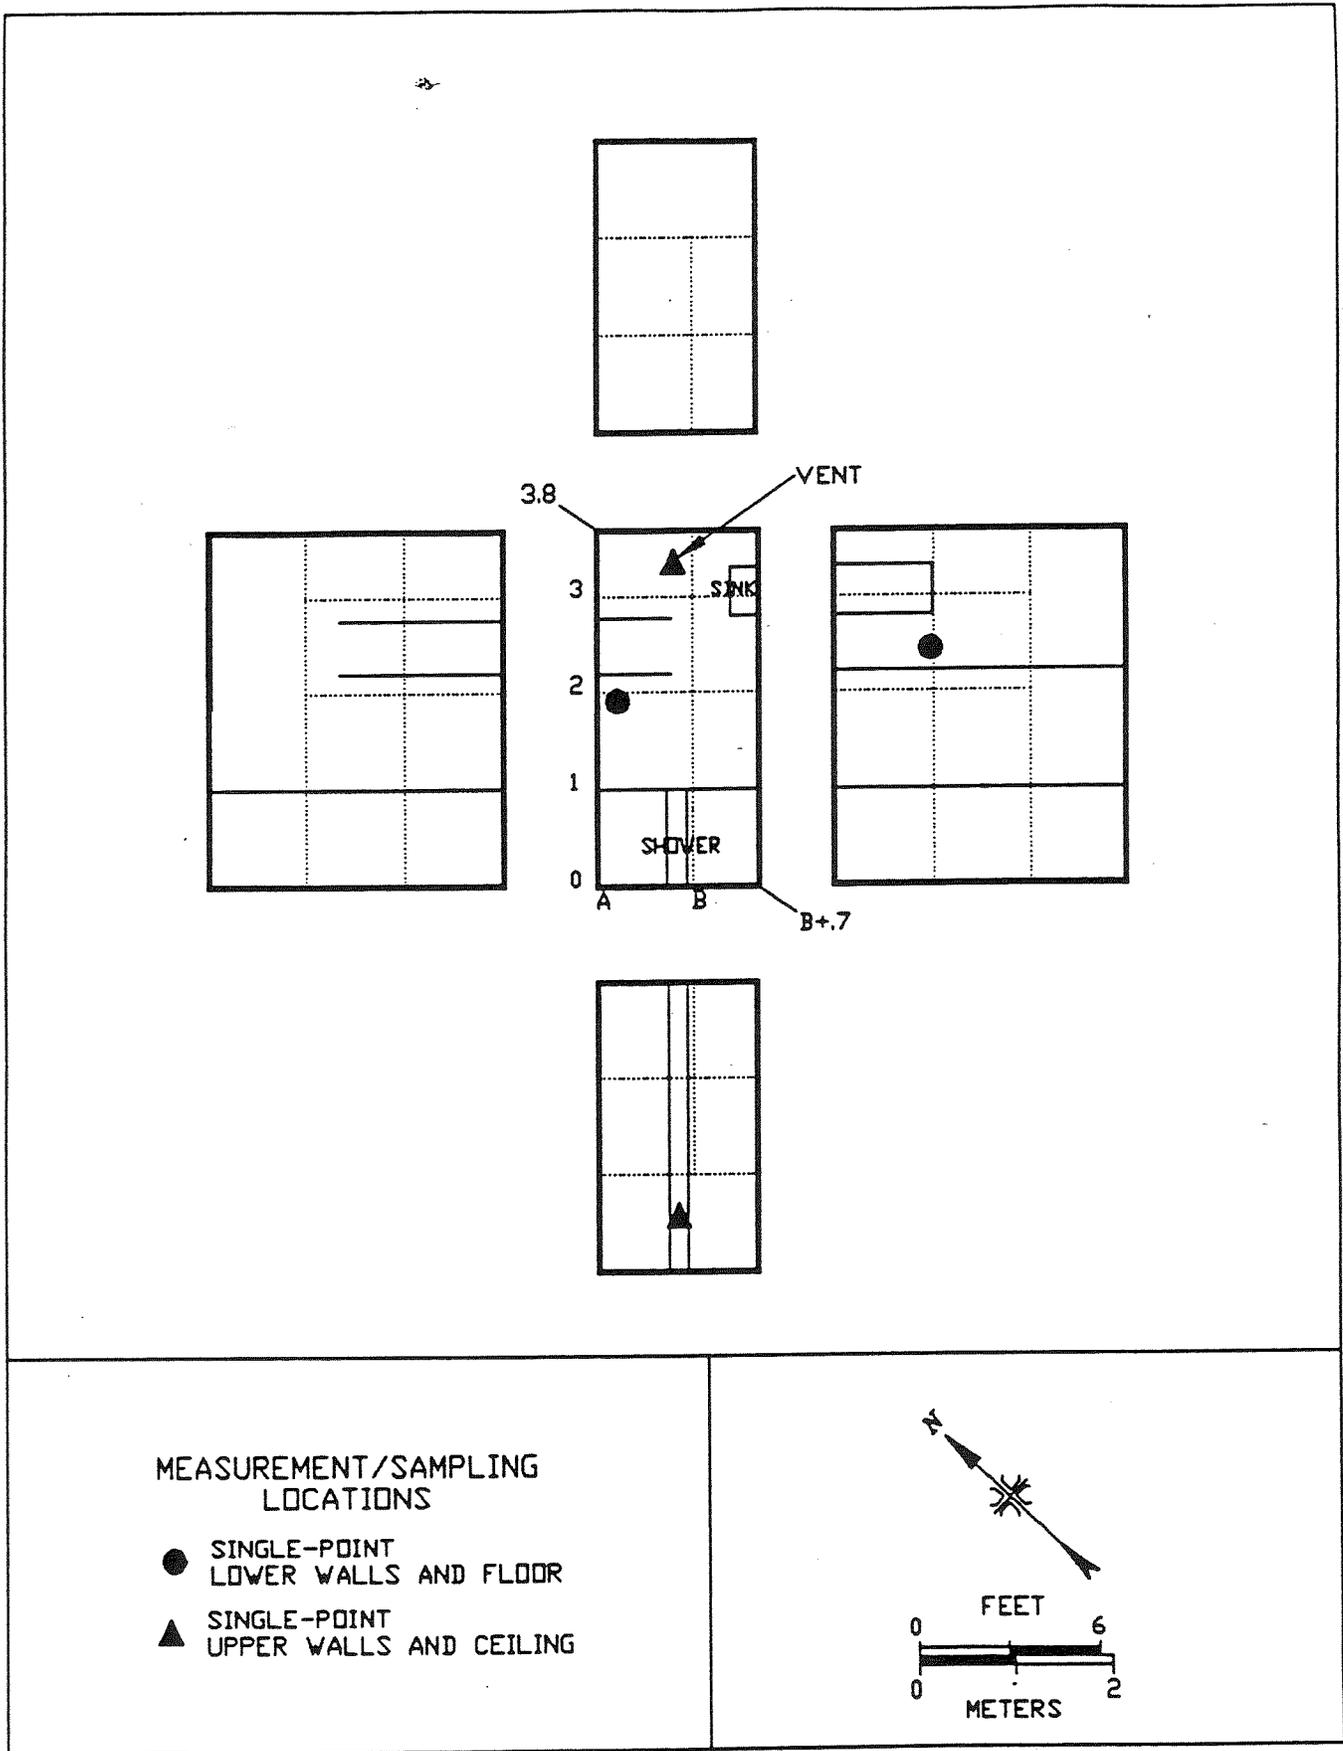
Building 005, Room 107A&B - Measurement and Sampling Locations
